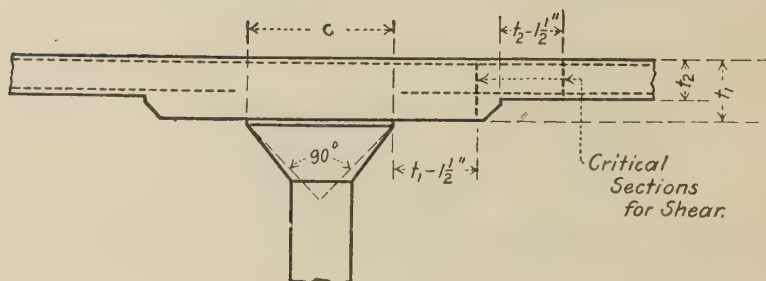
Typical Column Capital and Sections of Flat Slab with Dropped Panel.
